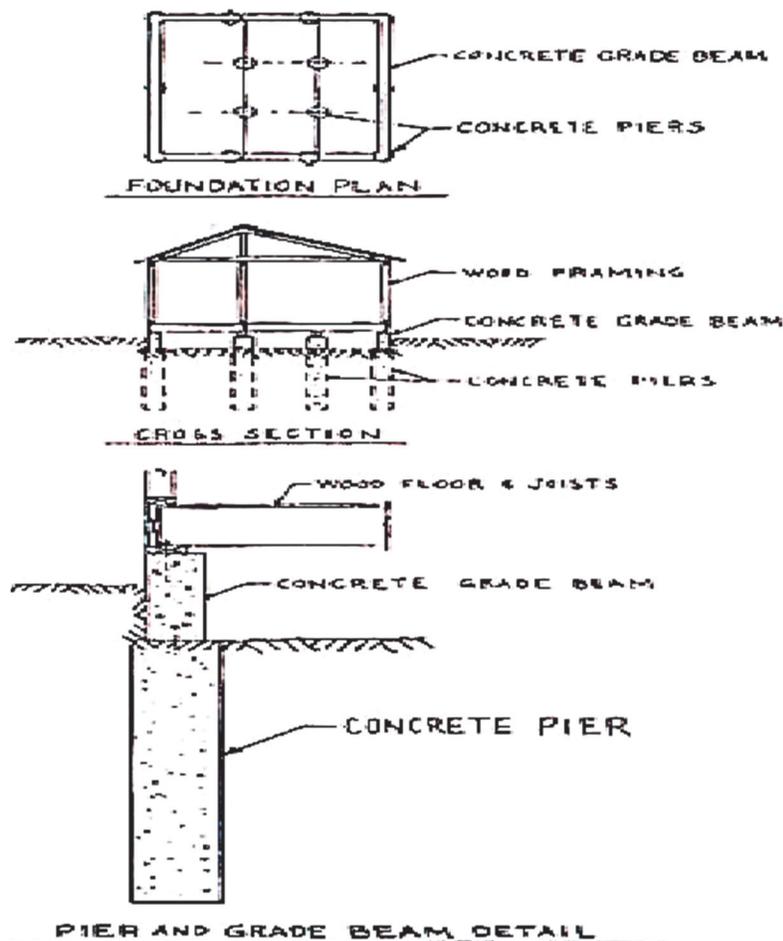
Drilled pier-and-grade beam foundation supporting first-floor wood framing.
